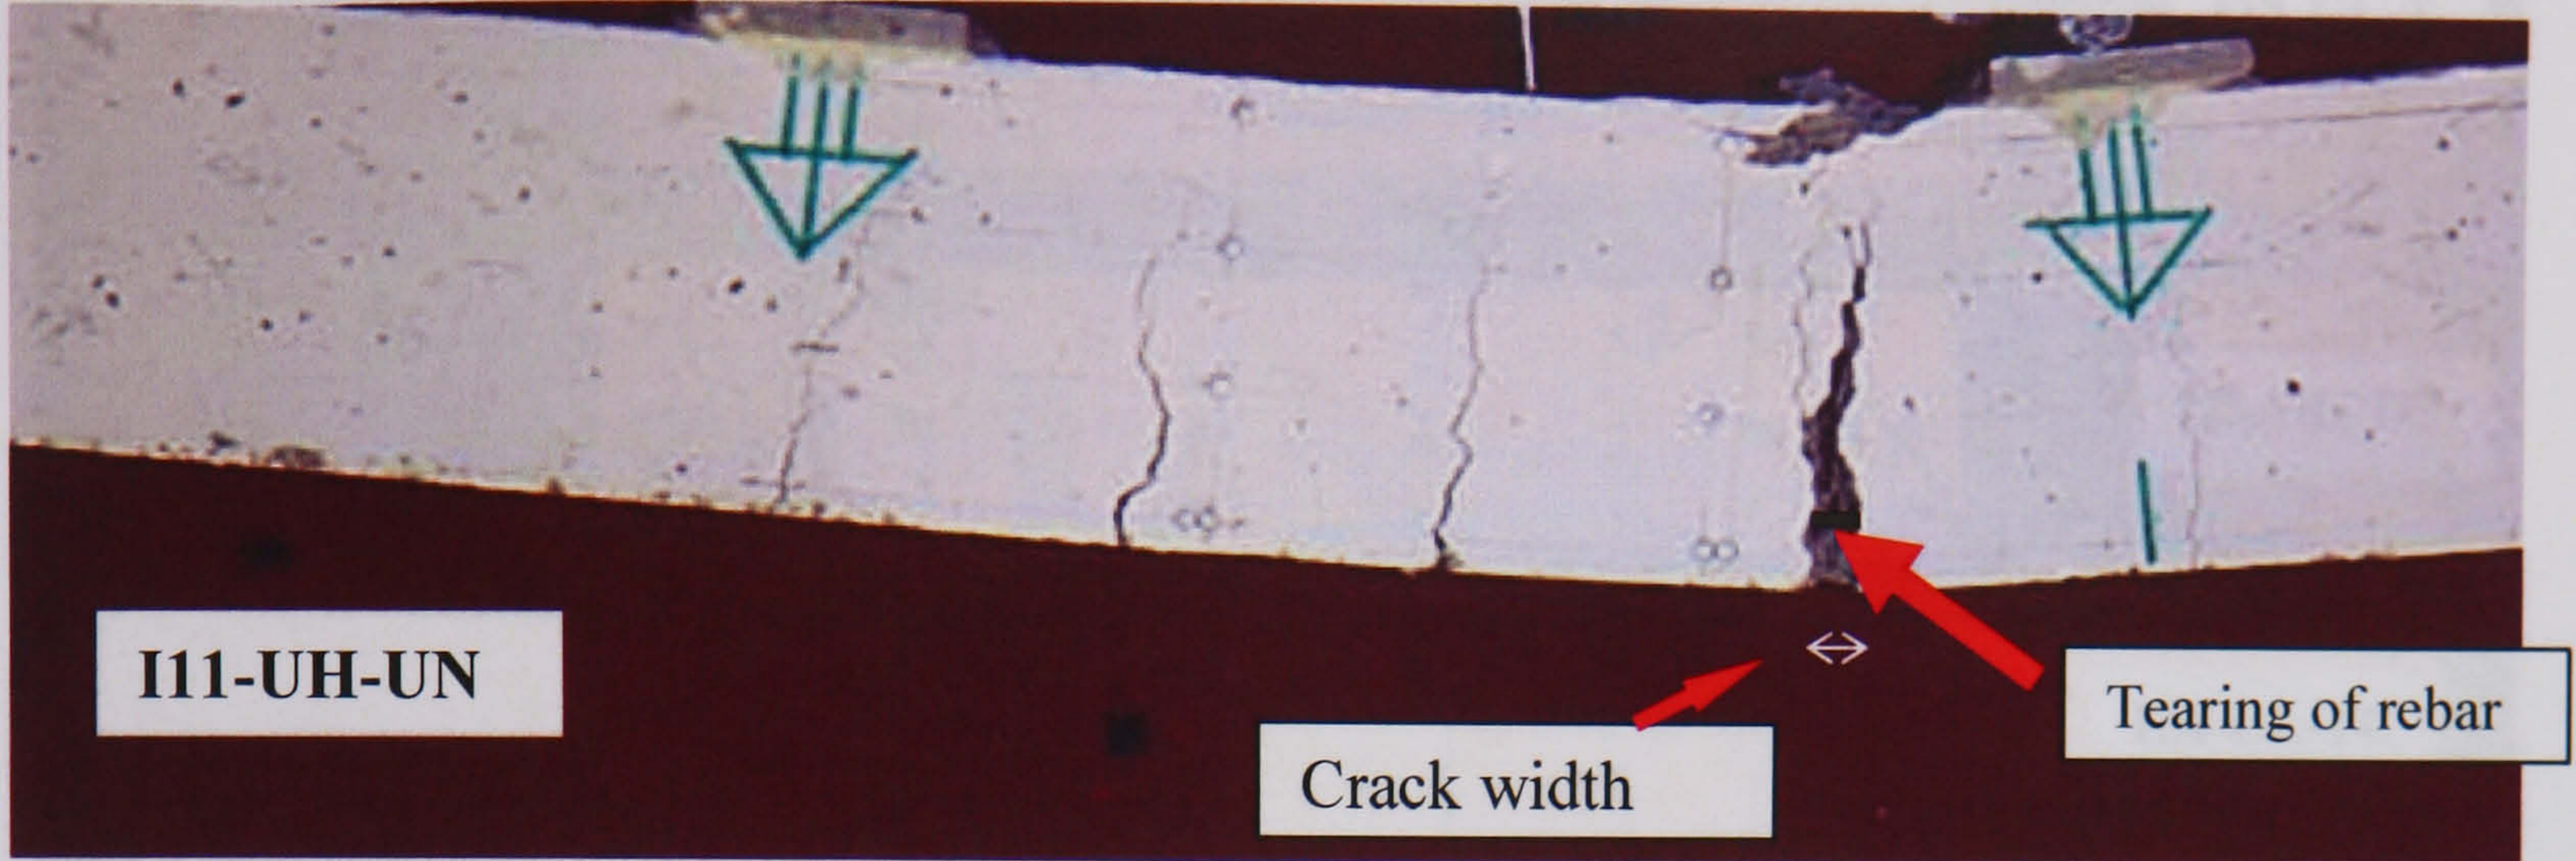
Typical flexure failure due to steel yielding near to the right point load, beam I11-UH-UN.
